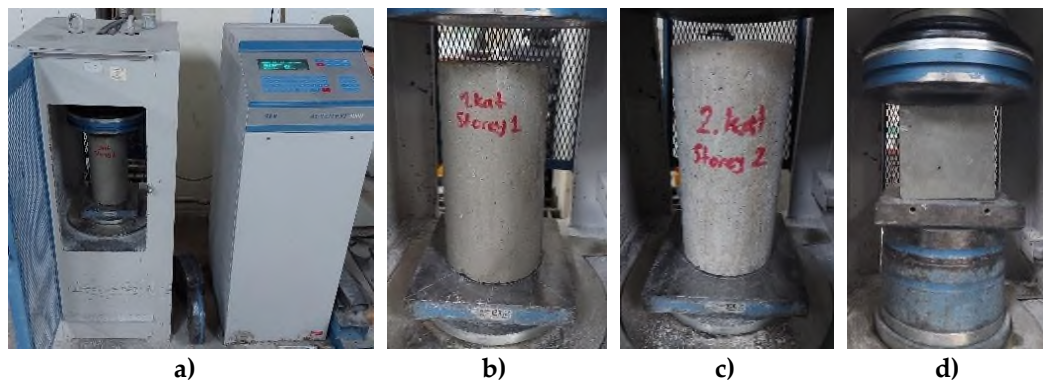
Standard compression tests; a) Test device, b) 1st story concrete sample, c) 2nd story concrete sample, d) Foundation concrete sample
